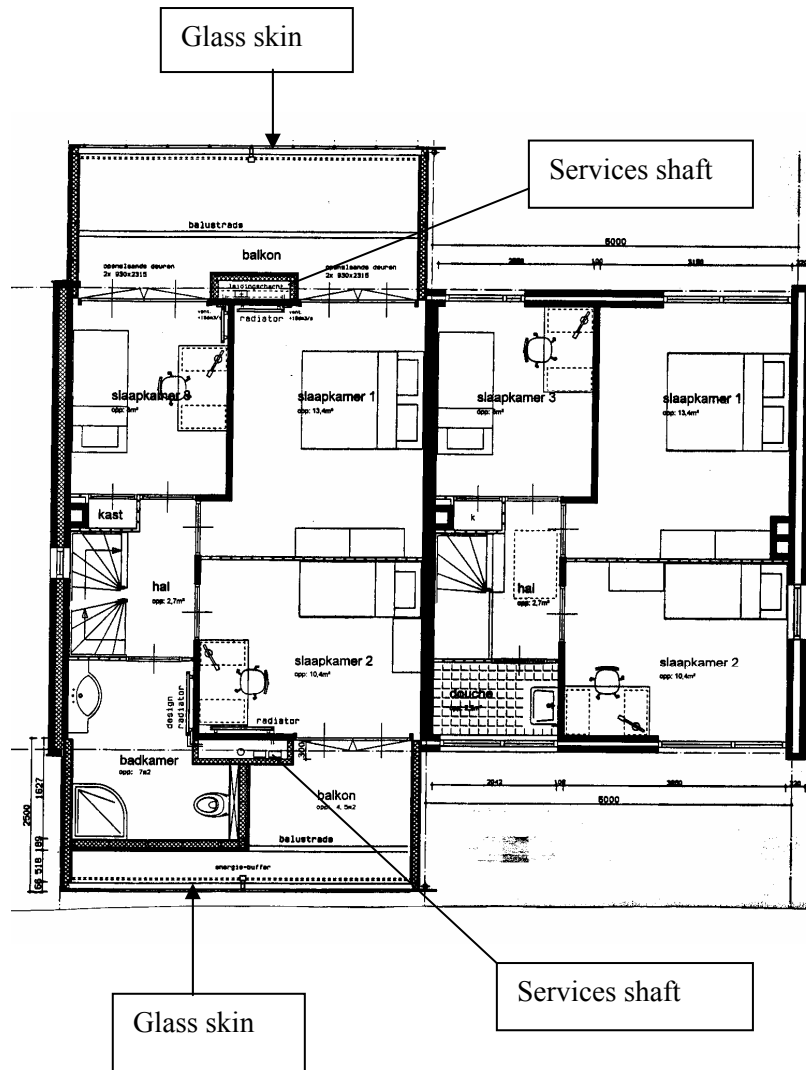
First floor in the new situation (left) and in the existing situation (right).
